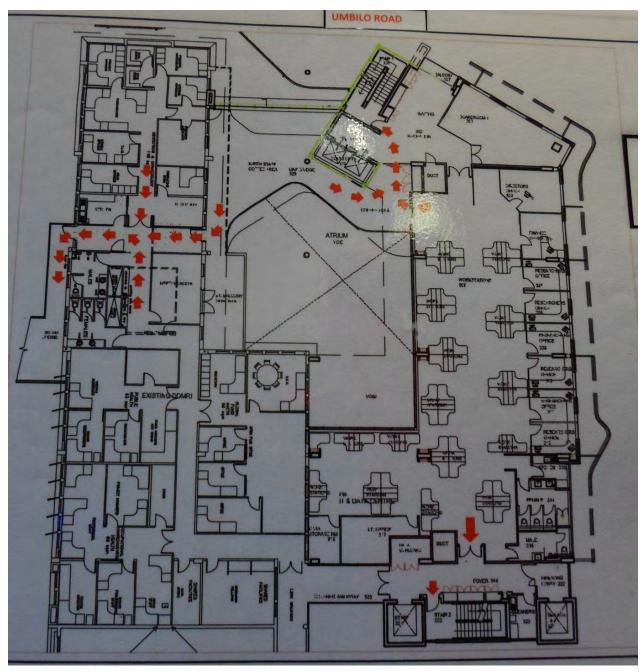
Second Floor CAPRISA offices plan (By Author)
